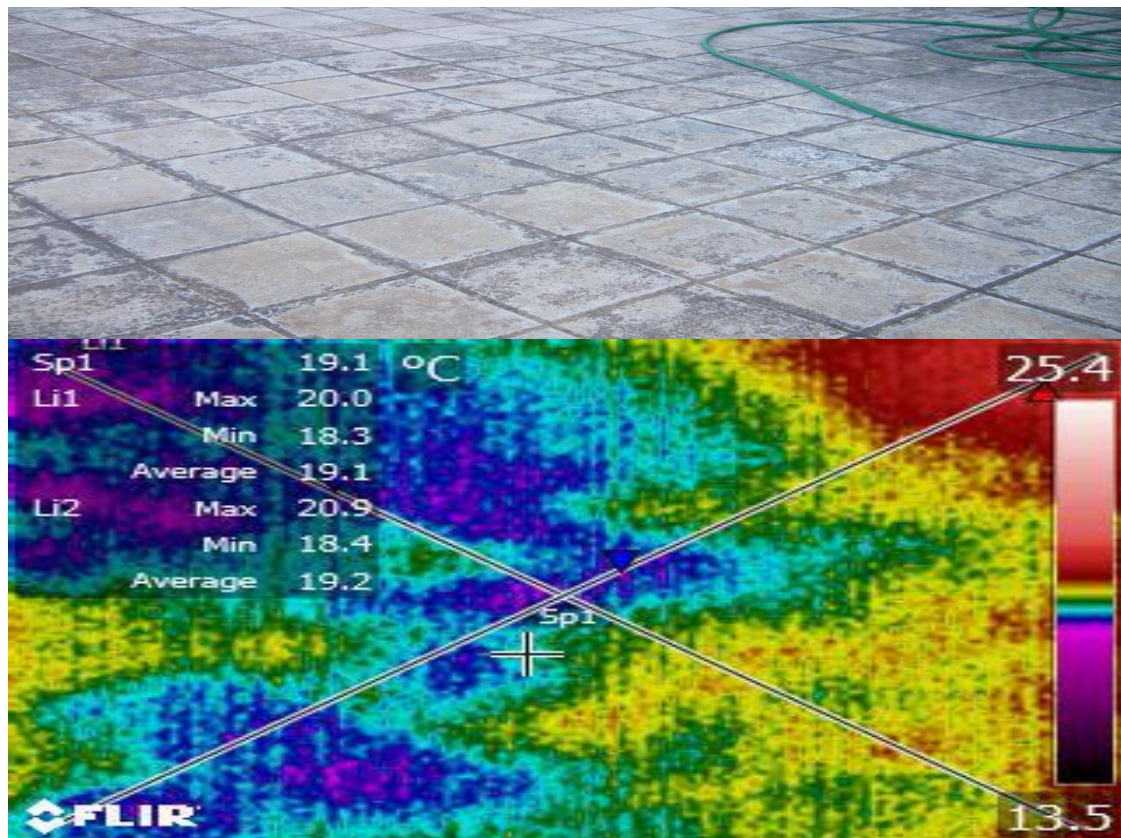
Thermal and visual photo of 2nd floor's roof tiles
